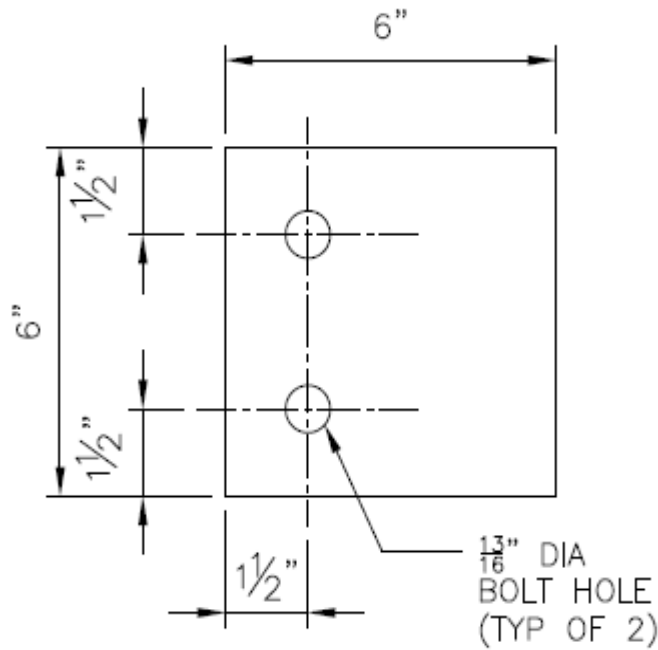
Double Bolt Shear Plate Connection
